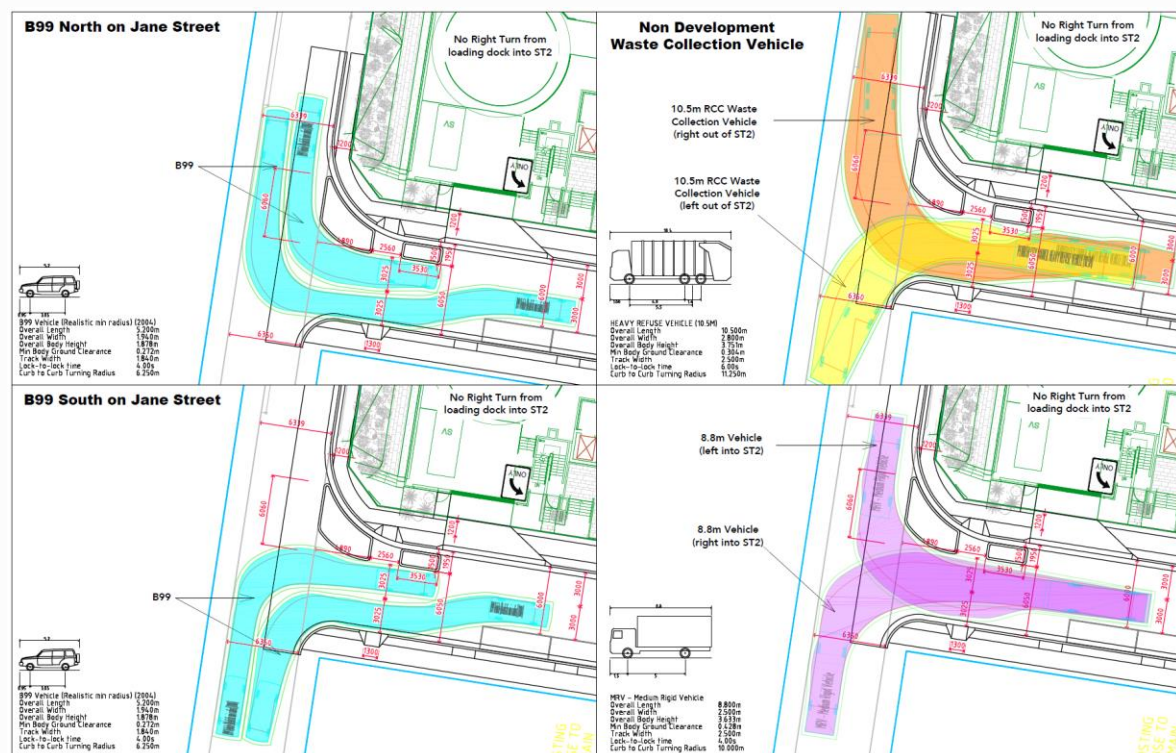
Swept Paths at the intersection of Jane Street and ST2 Road.
